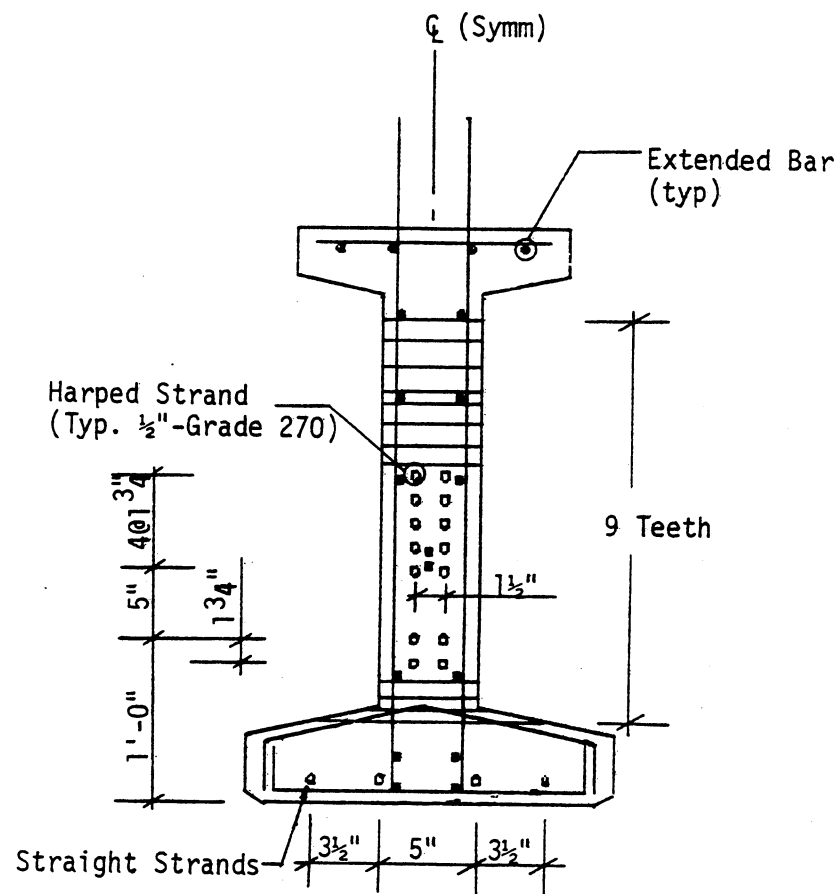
Field Test - Section through Mid-span of Girders 2C and 3C
